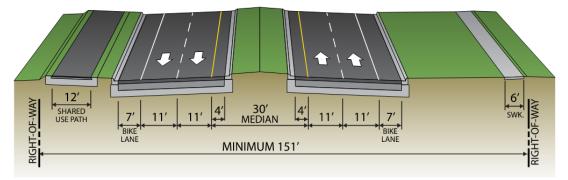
Proposed Urban Typical Section Fowler Ave to Stacy Road
